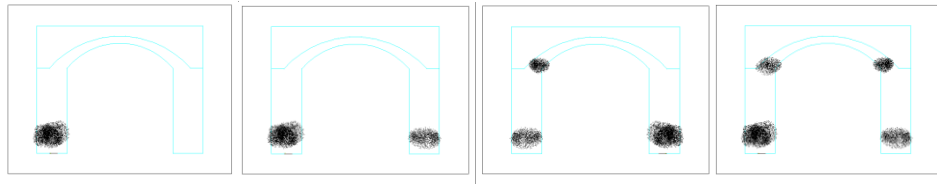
(b). Crack pattern for pier heights 13 to 17 meters
